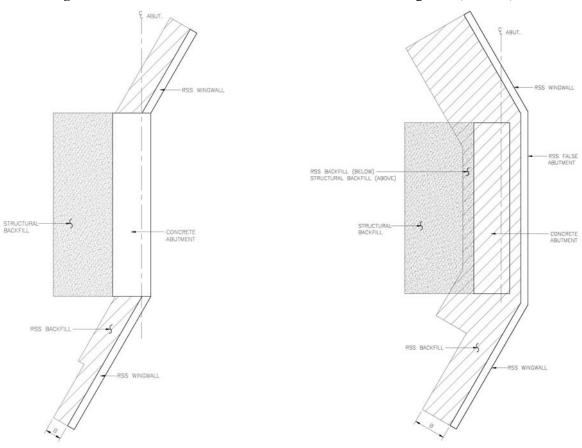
Backfill for Concrete Abutment with Figure 5.36: Backfill for RSS False Abutment with Flared RSS Wingwalls (B=0.8H).
